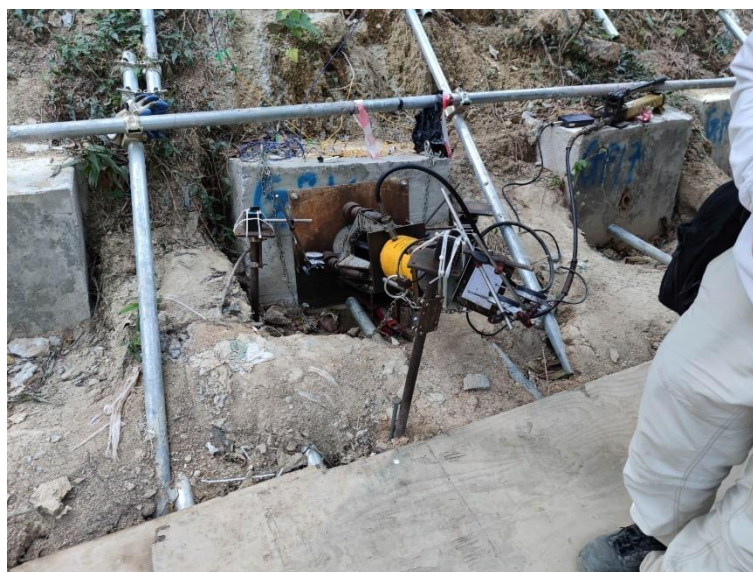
Pull-out test for glass fibre reinforced resin soil nail
